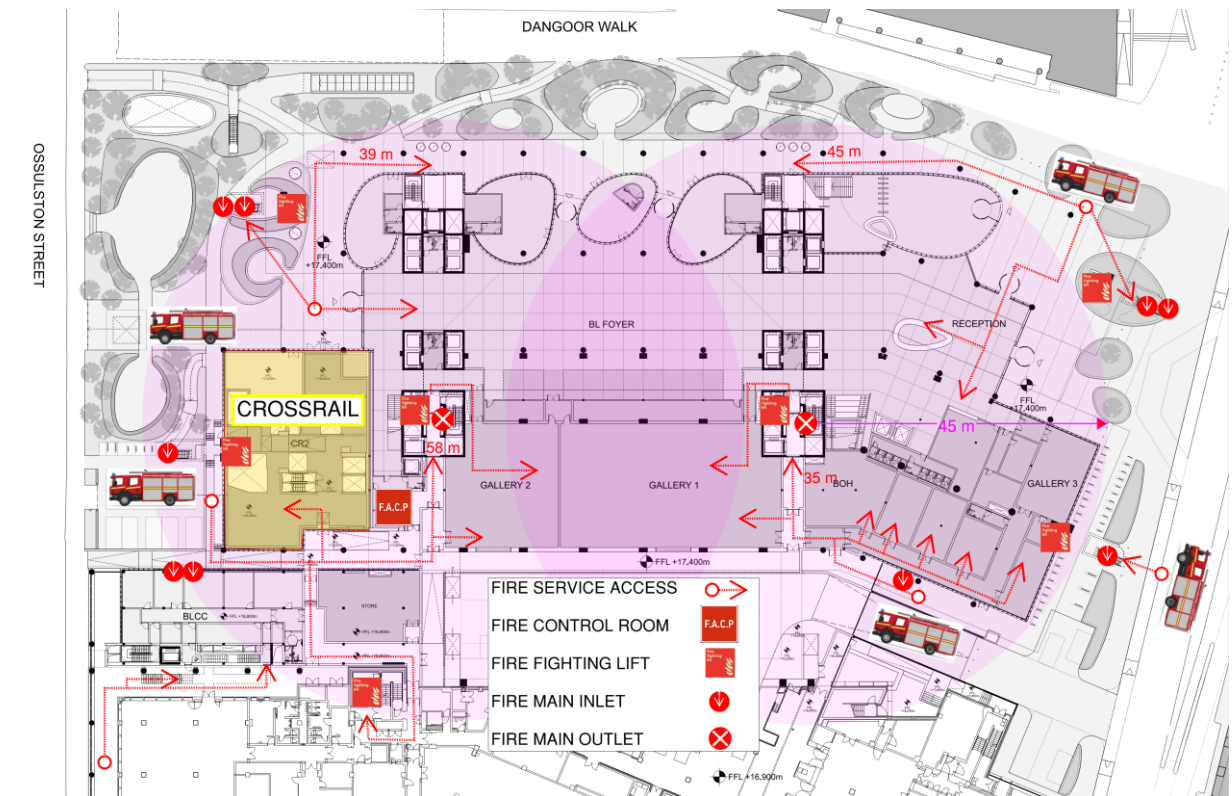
Site plan showing firefighting access. Magenta shading indicates areas within 45m from a fire main outlet
